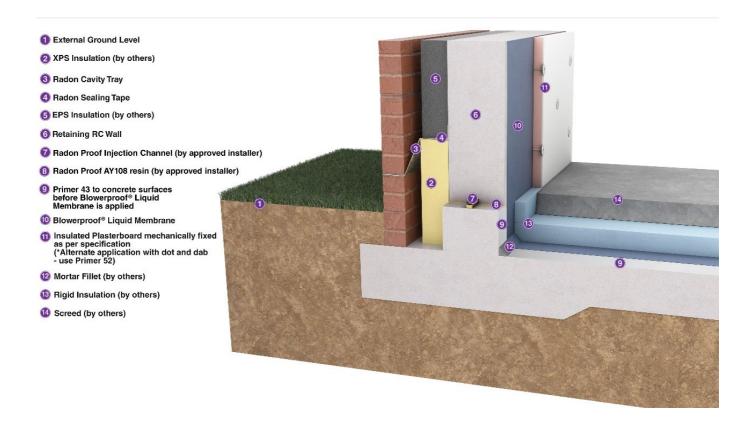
Radon detail at Base of wall - Reinforced Concrete
